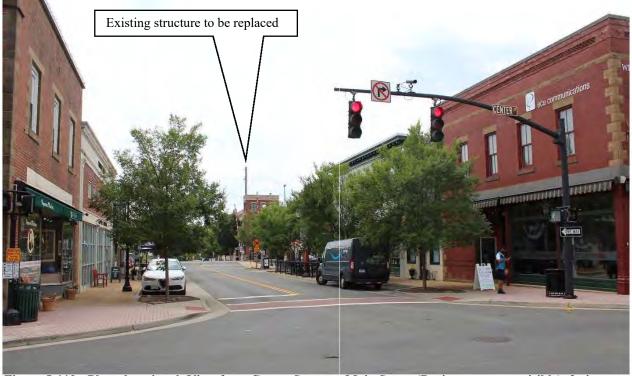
Photo location 6- View from Center Street at Main Street (Project structure visible), facing south.
